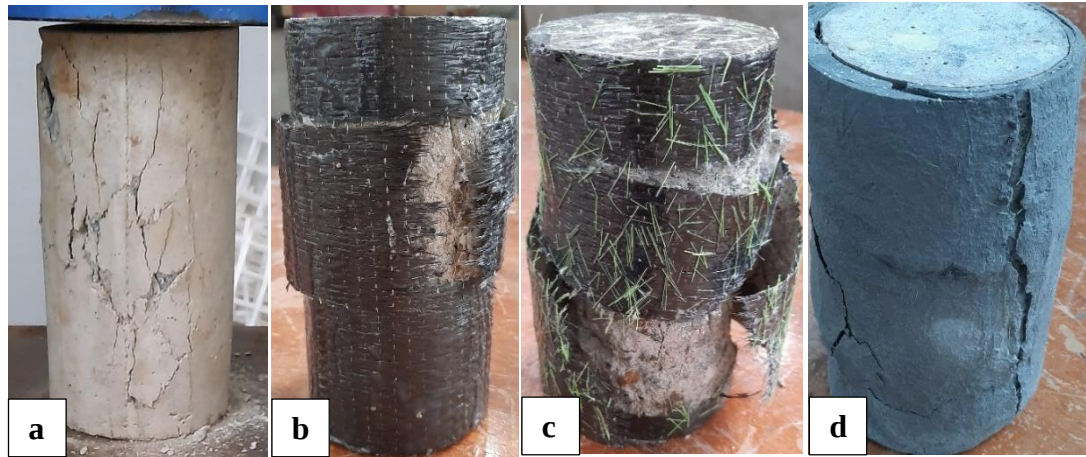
Failure modes of concrete cylinders (a) without CFRP (b) CFRP wrapped with pure epoxy adhesive (c) CFRP wrapped with modified epoxy adhesive (d) CFRP wrapped with ECC adhesive
